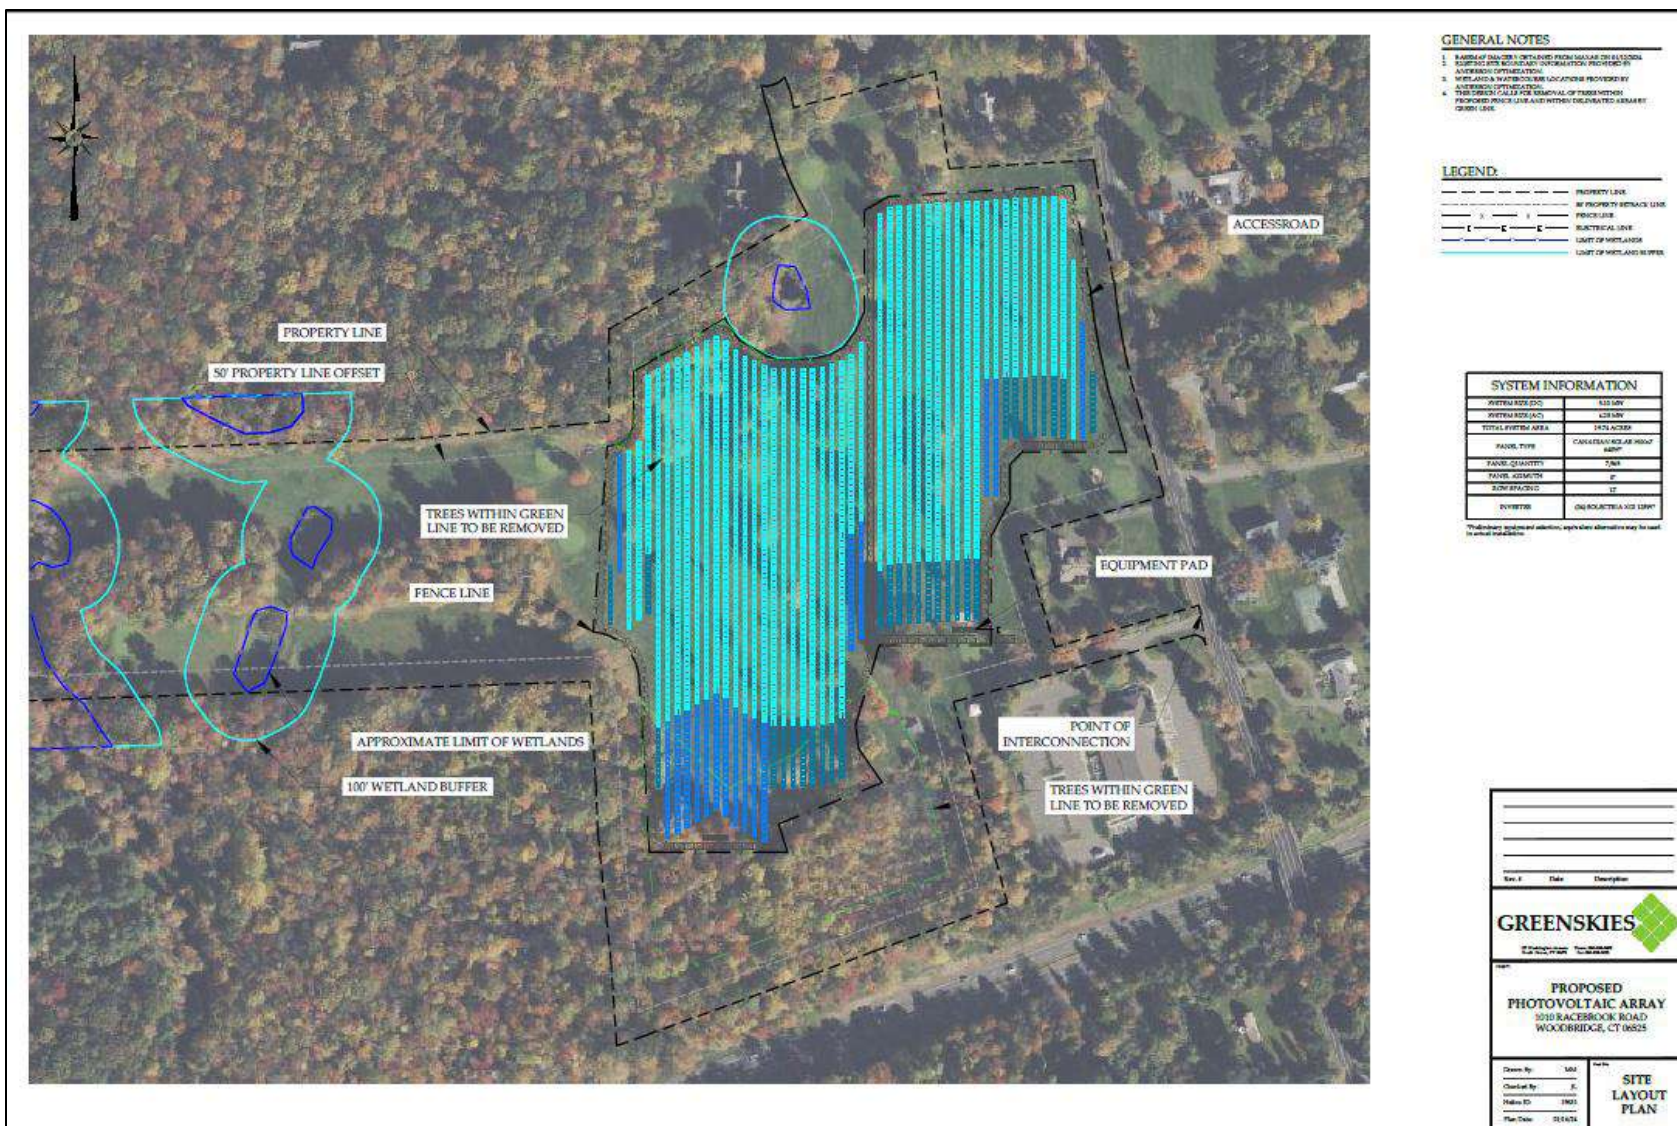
Digital map depicting the client's project plans for the solar facility in Woodbridge, Connecticut.
